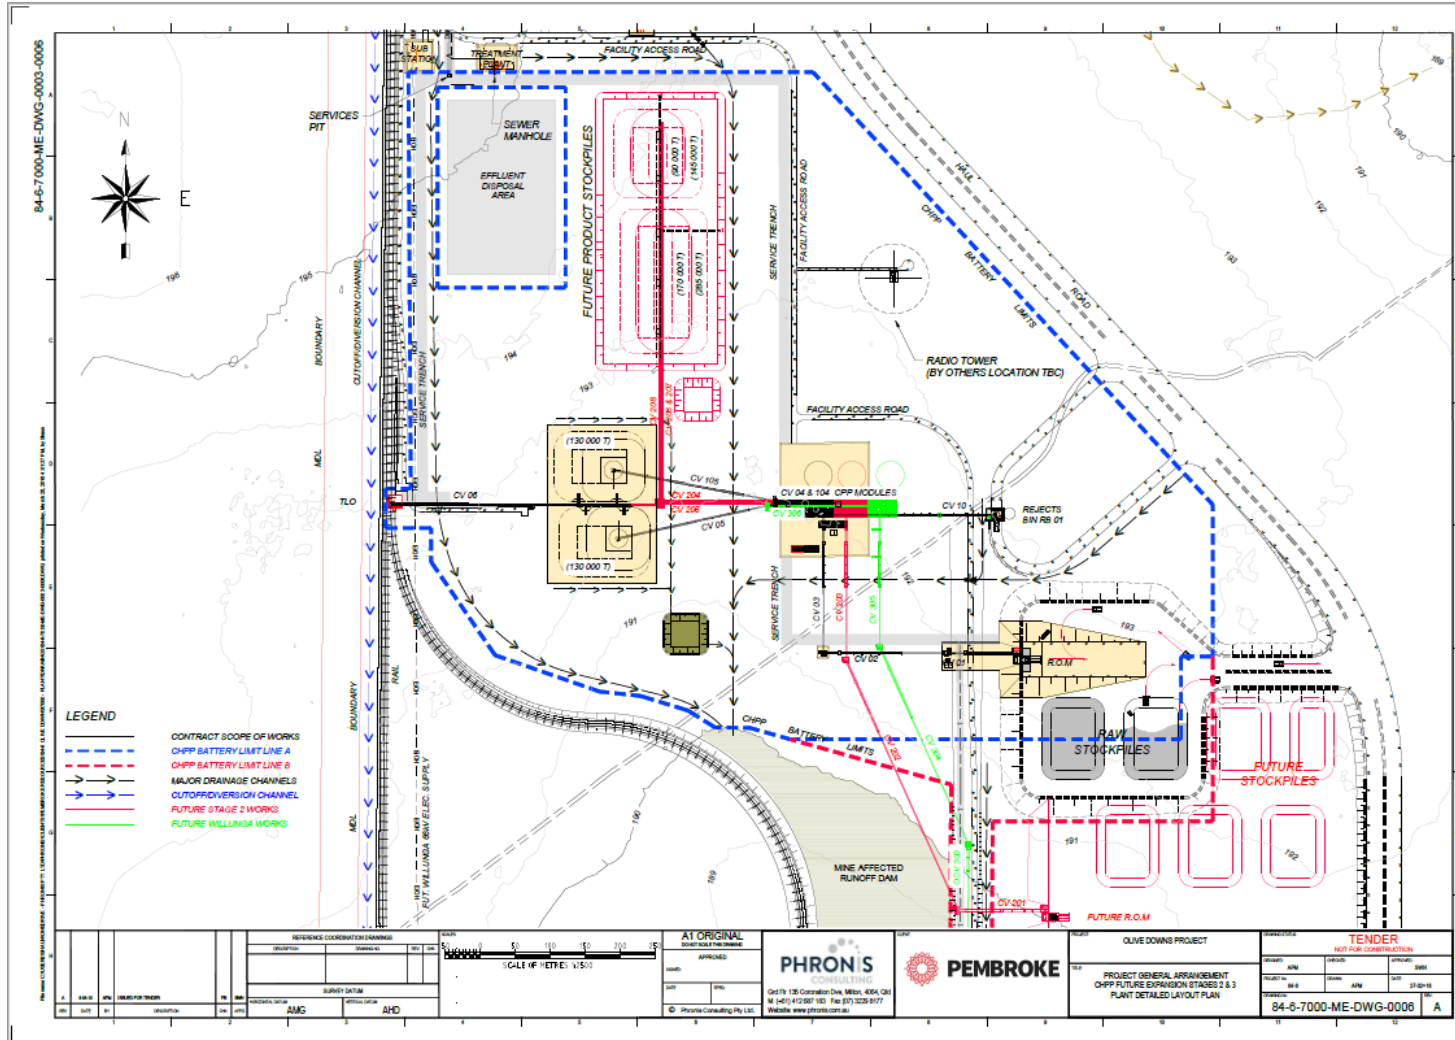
Complex Development Plan – ODS – Infrastructure Detailed Layout Plan
